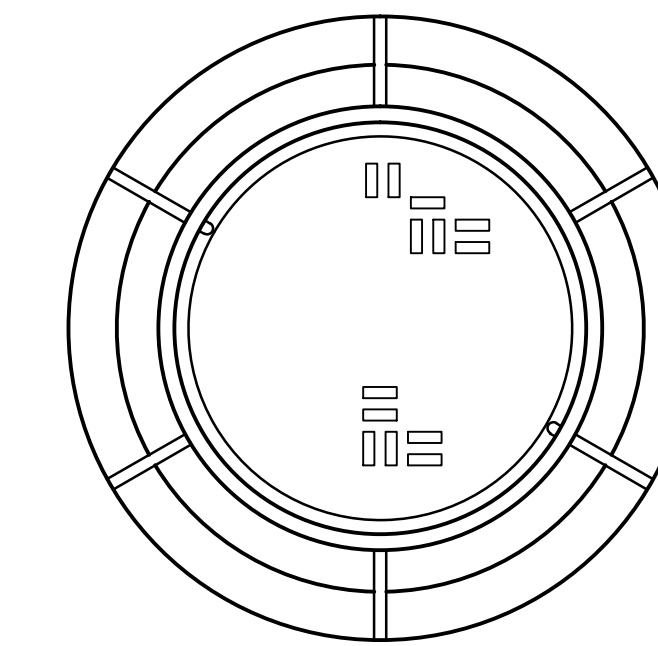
DETAIL: STANDARD DRAINAGE INLET CHAMBER
